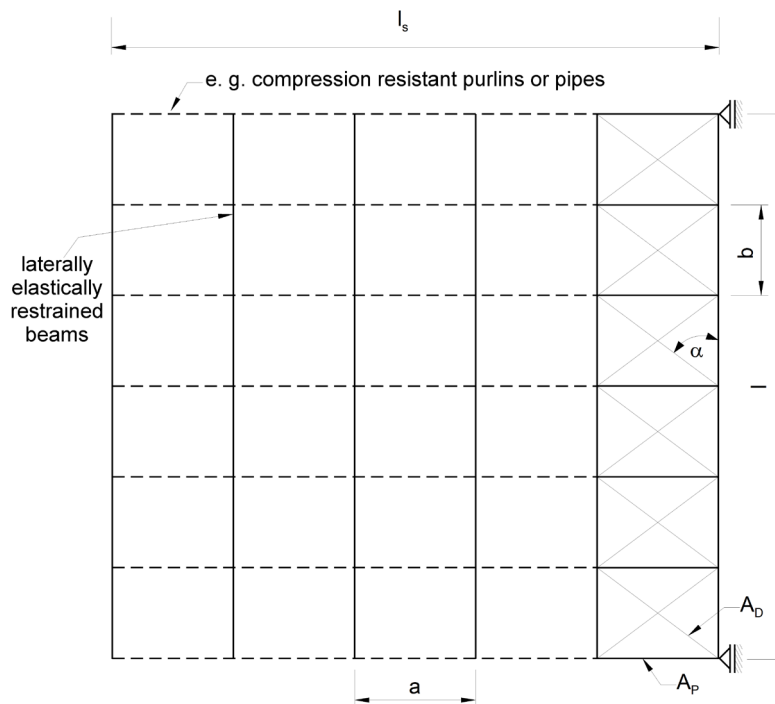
Frame beam with trapezoidal sheeting and bracings
